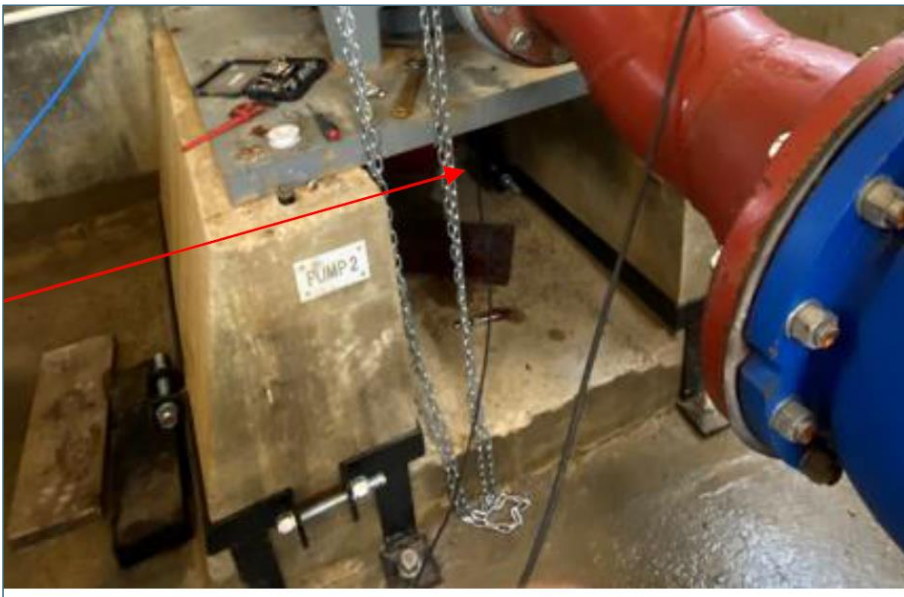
Steel Reinforcement to Concrete Pump Plinth
